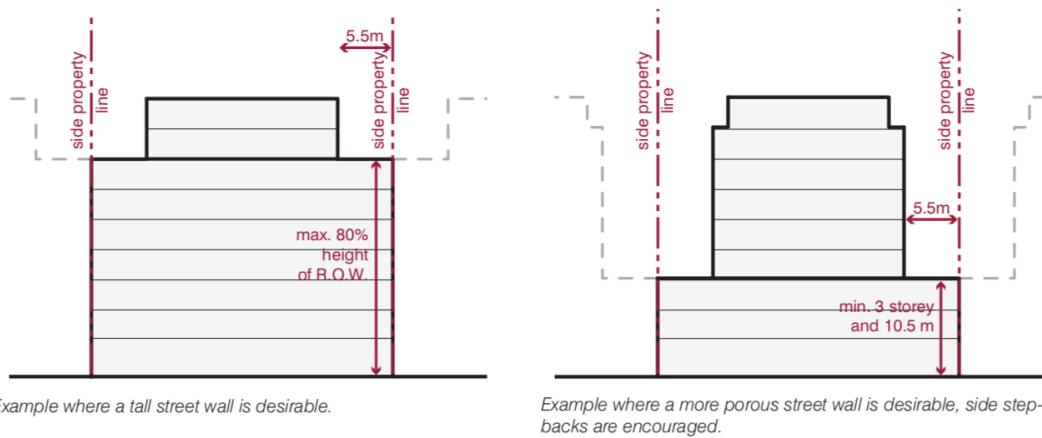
| Step-backs and street wall vs. porous wall examples (BMI + Pace, 2010)
